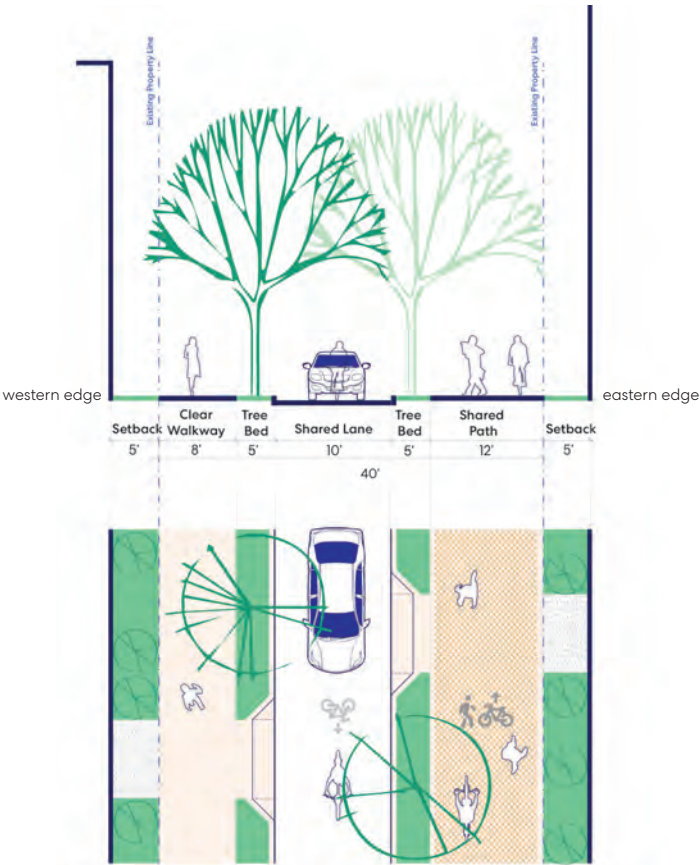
Typical Ash Street section between Page Mill Road and Olive Avenue
